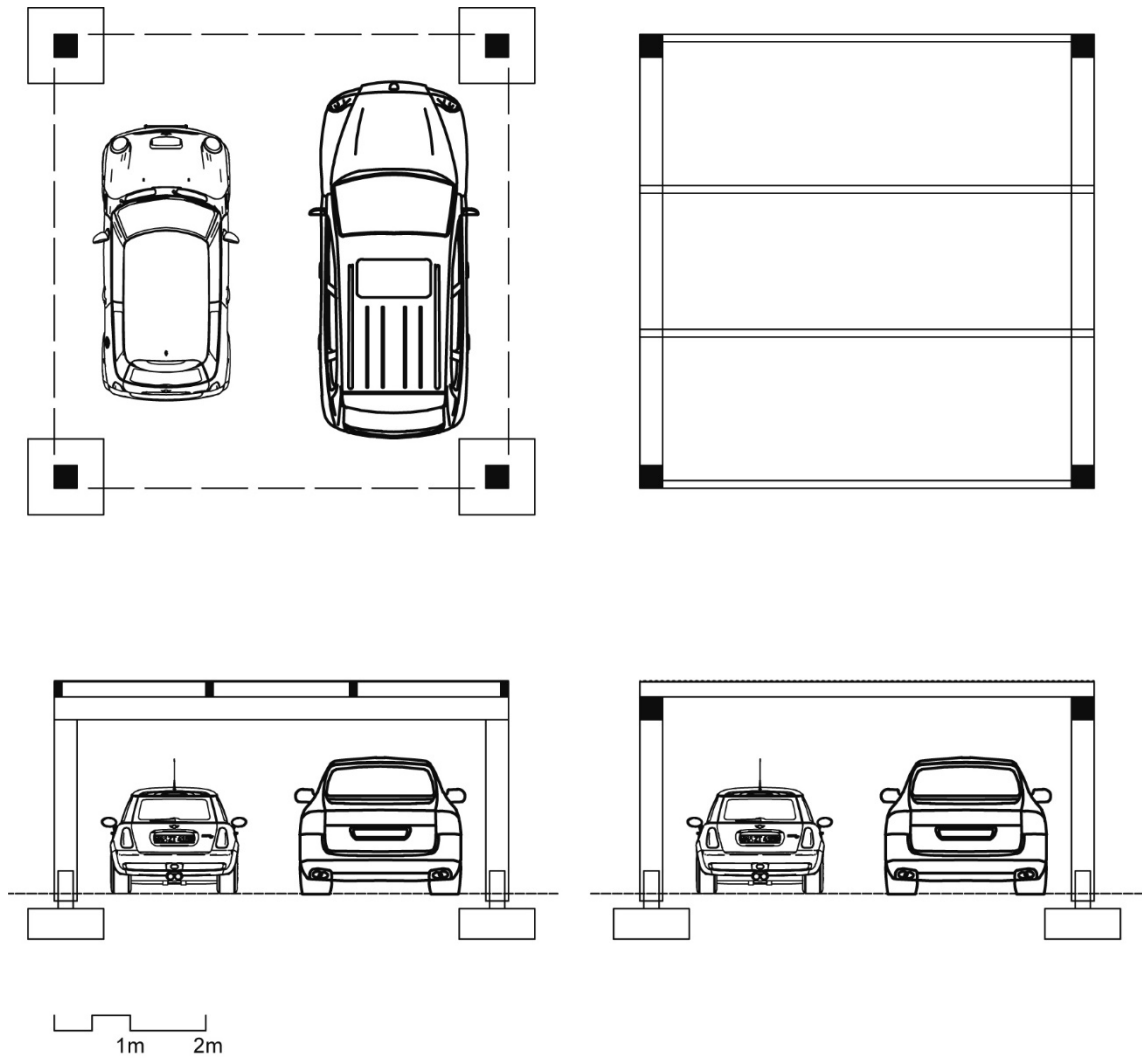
Second design hypothesis: timber roof with two primary beams resting on the columns and four secondary beams resting on the primary ones.
